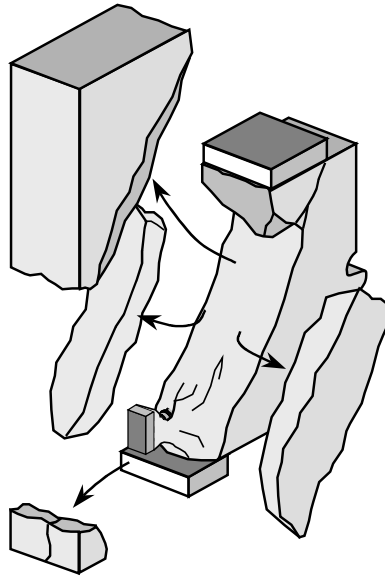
Pullout failure of a non-headed bar (specimen CCT-08-55-00.00-1)
